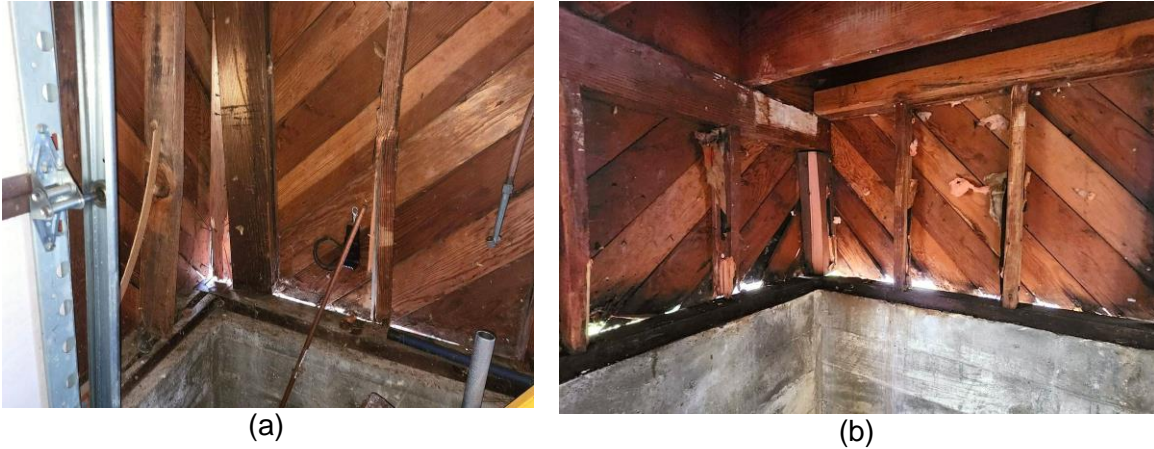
Views of cripple walls from inside garage. Cripple walls were sheathed by diagonal wood boards. (a) View toward corner next to garage door. Notice sunlight in gap where sheathing pulled away from sill plate. Some 2x4 wall studs were fractured. (b) View toward back corner. The cripple walls are shorter here than those near garage door. Notice the separation of sheathing from sill plate. There was evidence of wood deterioration even though redwood has good decay resistance. Deterioration might have been caused by wood shake siding trapping moisture (Figure 5.10b).
